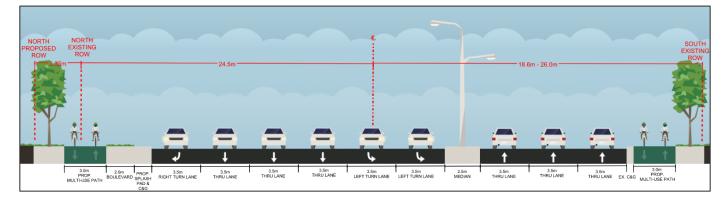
Typical Cross-Section for Derry Road East of Bramalea Road (facing east)
